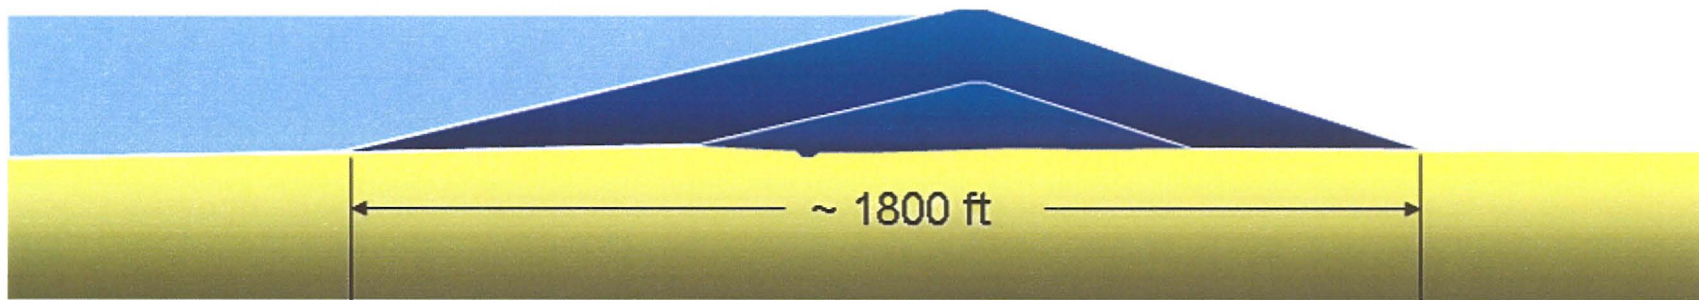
Dam Cross Section – Reservoir at Elev. 1640 ft.
